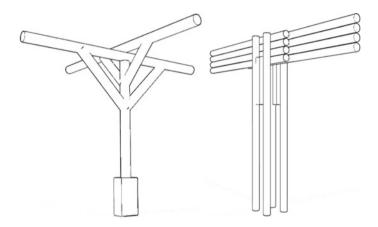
Bamboo columns and beams: (left) tree-like knee-bracing, (right) configuration of bamboo columns and beams [37]
